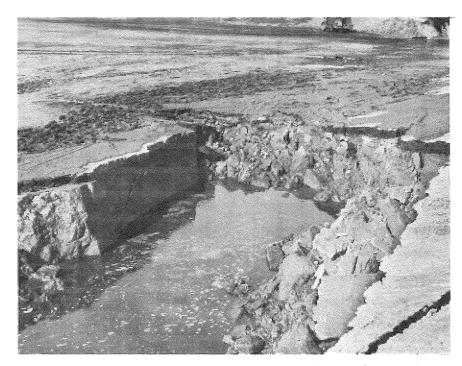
Ruptured lining near drainage inspection chamber, December 16, 1963.
